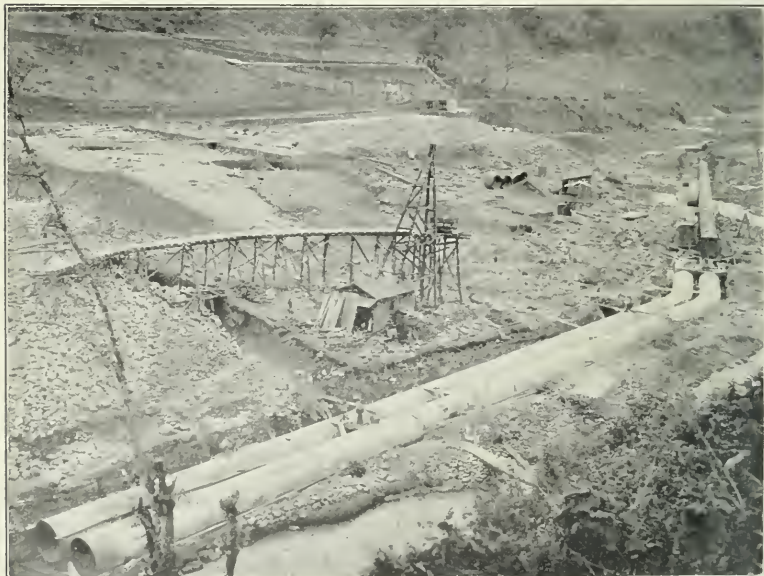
FOUNDATIONS AND DOUBLE EIGHT-FOOT OUTLET PIPES, FOR DAM NO. 3, AT TEZCAPA.
